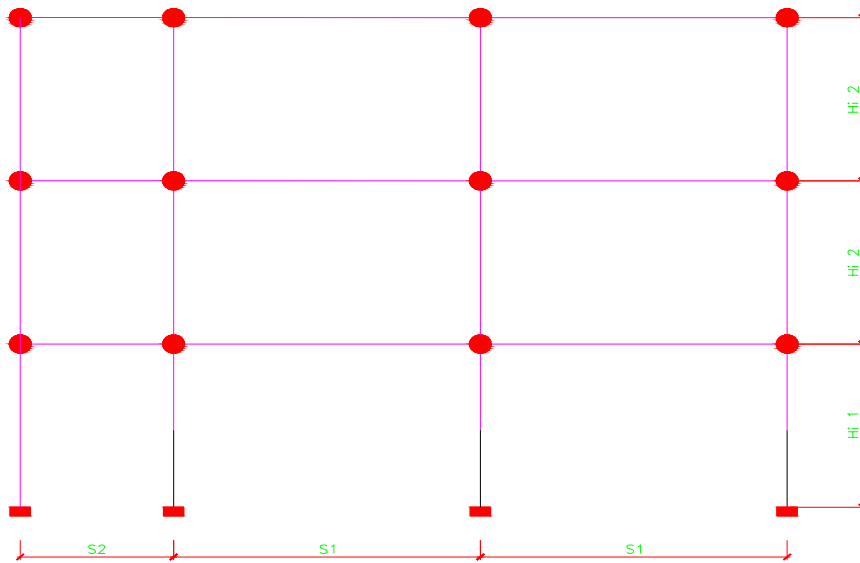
Elevation of a typical frame of a 3 story commercial/office building.
